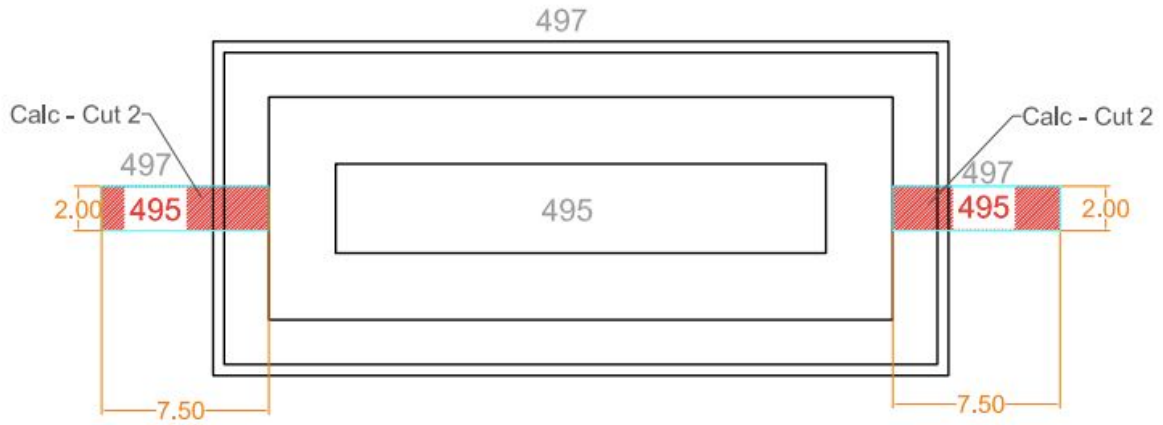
The area corresponding with Cut 2 calculations reported in Table 5. Grey numbers are current elevations and red proposed elevations. All dimensions are in feet.
